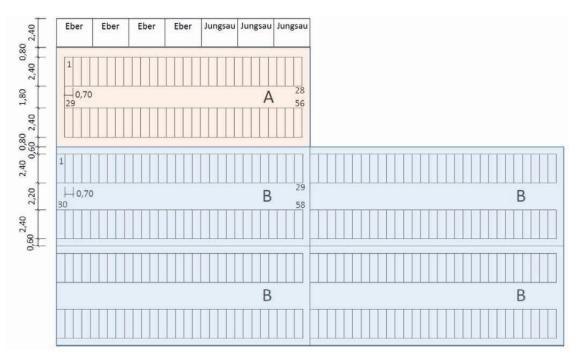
Floor plan of the service area (building 1 and building 2) with sow crates with a width of 70 cm and a stay of 4 days for small group keeping; 56 animal places in the service area (orange); 232 place (4 x 58) in the waiting building with group keeping (blue); scope of stock reduction 3.57 %
